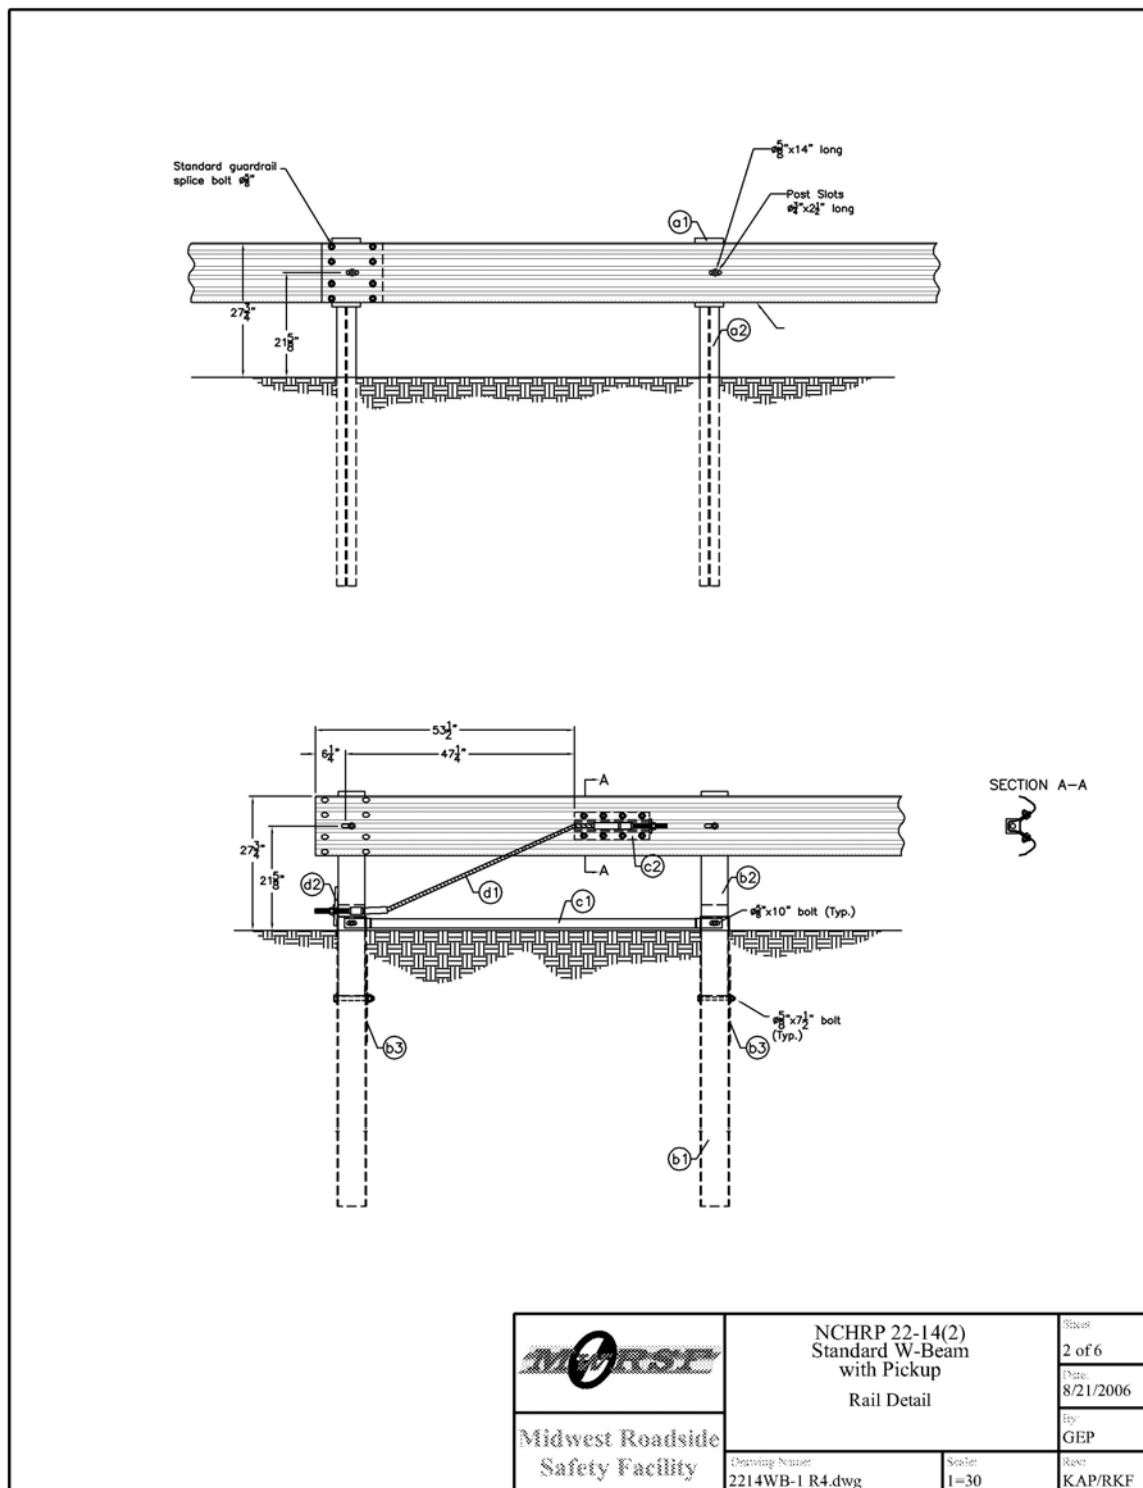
Standard Height, Strong Post, Wood Blockout W-beam Guardrail Rail Details (English)
